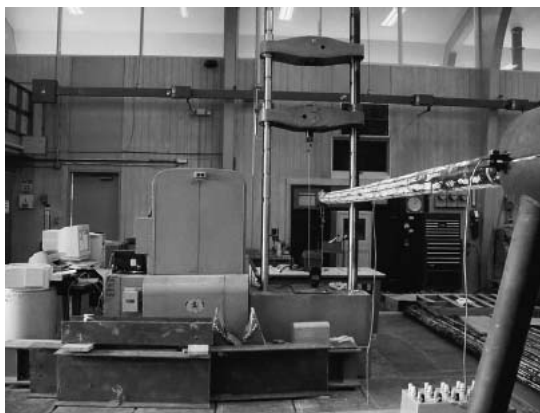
A full-size composite pole as tested in a RIEHLE machine.
